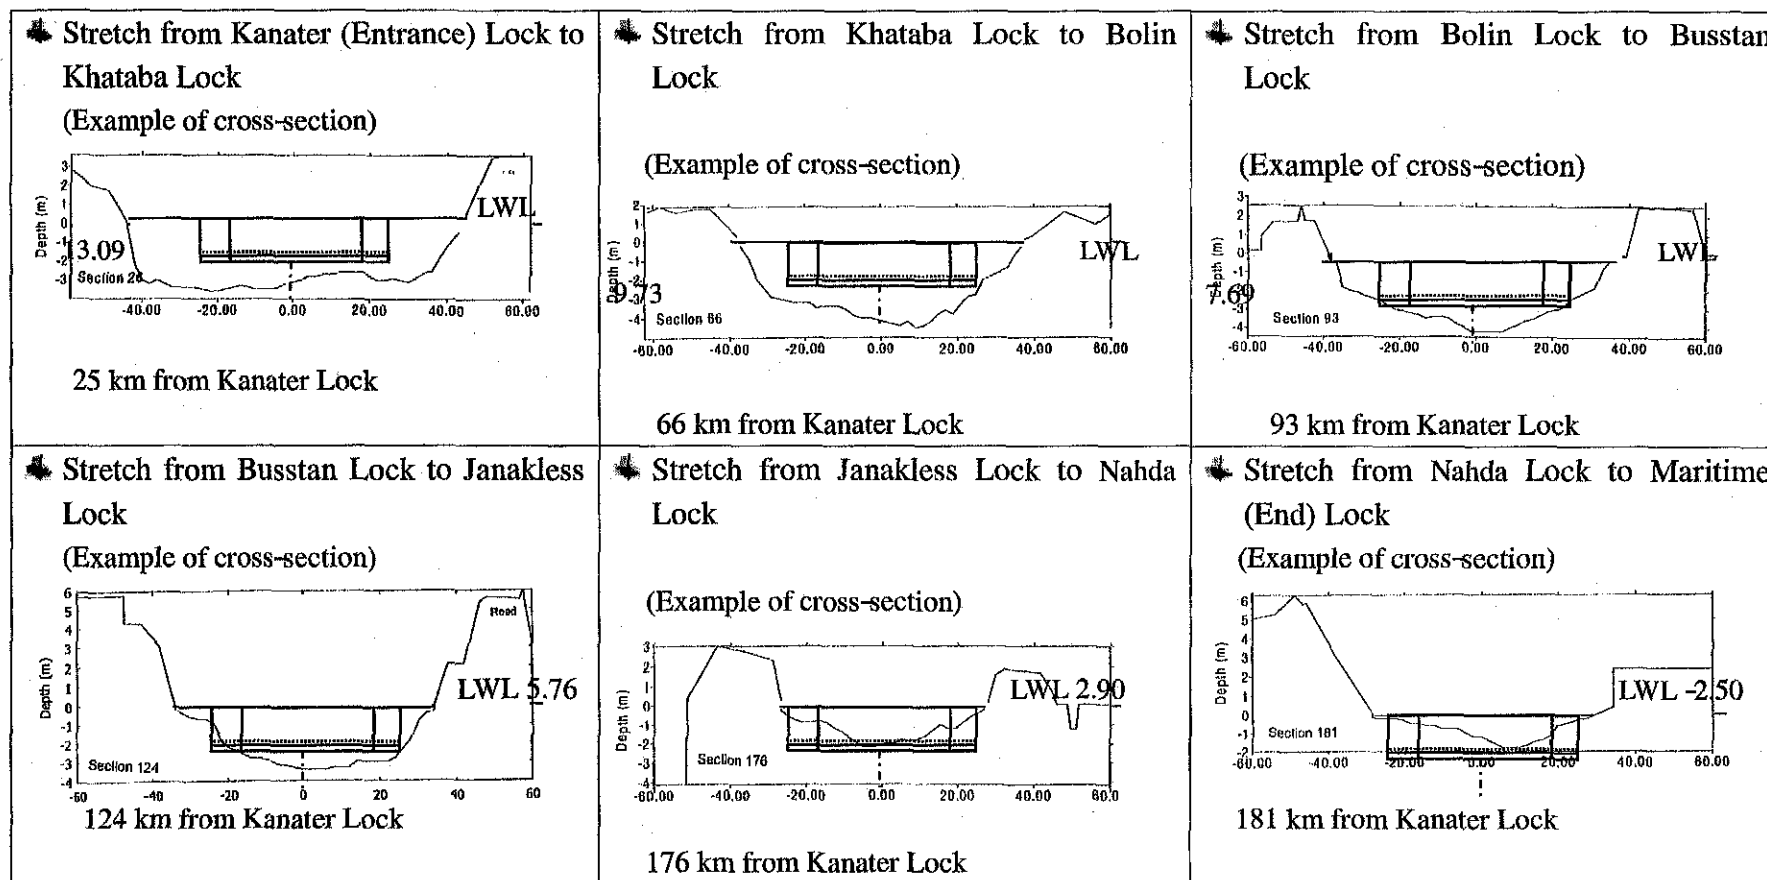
Examples of Typical Cross-Sections in each Stretches
